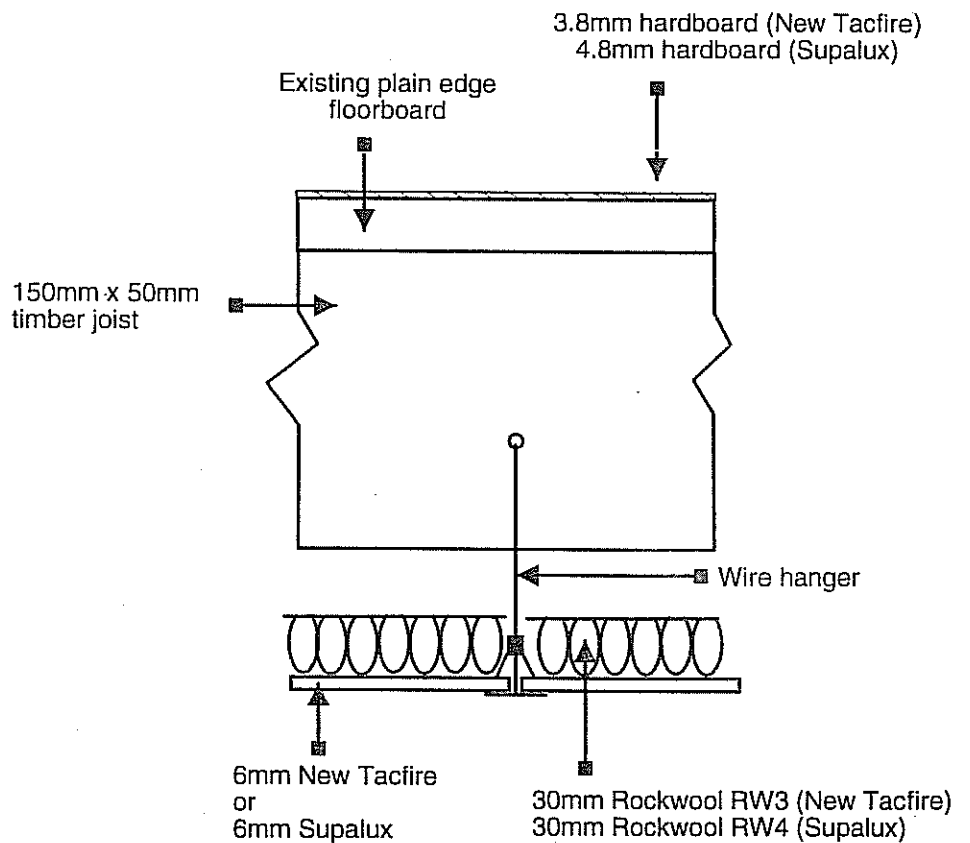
Use of Rockwool and New Tacfire or Supalux to provide a suspended ceiling of 60 minutes fire resistance
